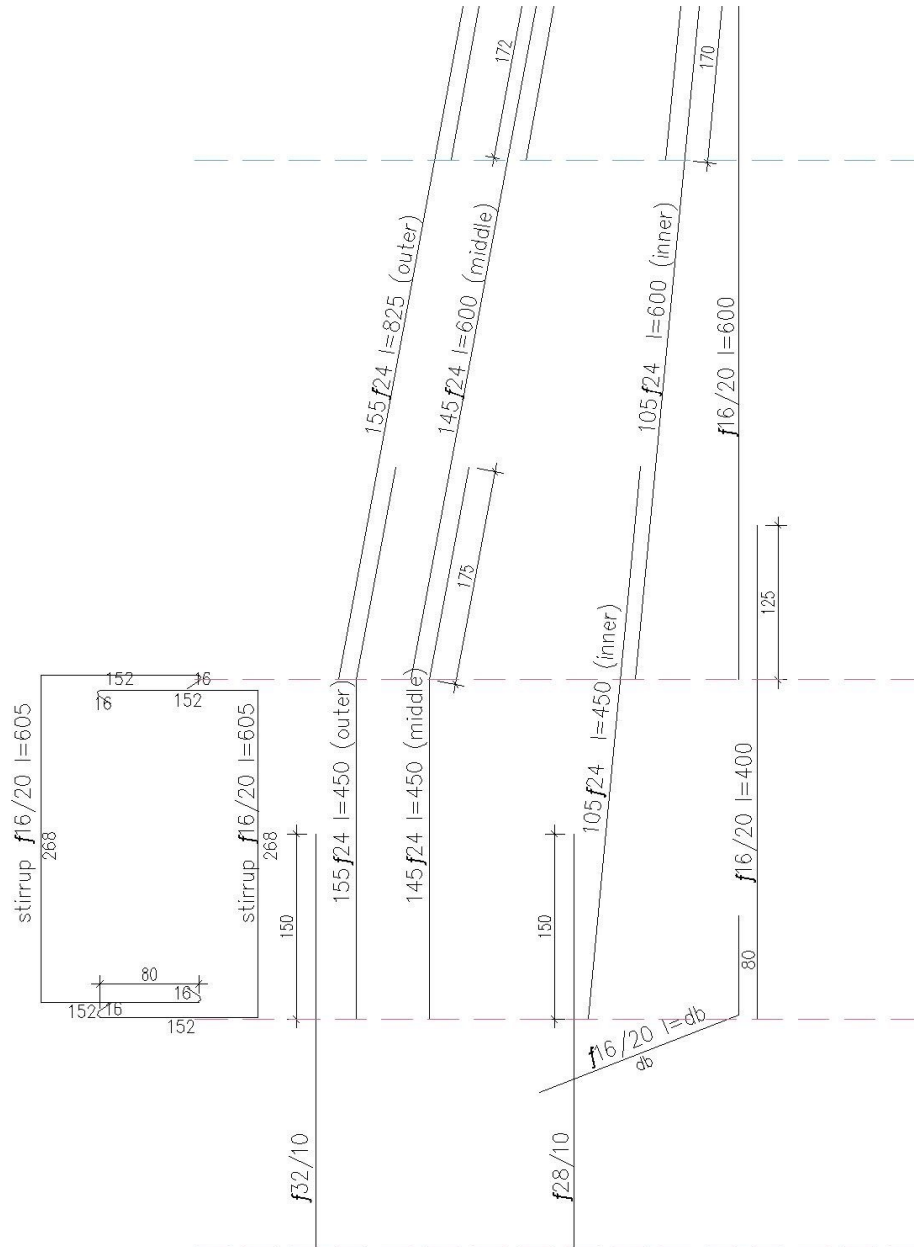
Geometrical and reinforcement properties of the minaret (Transition segment section)
